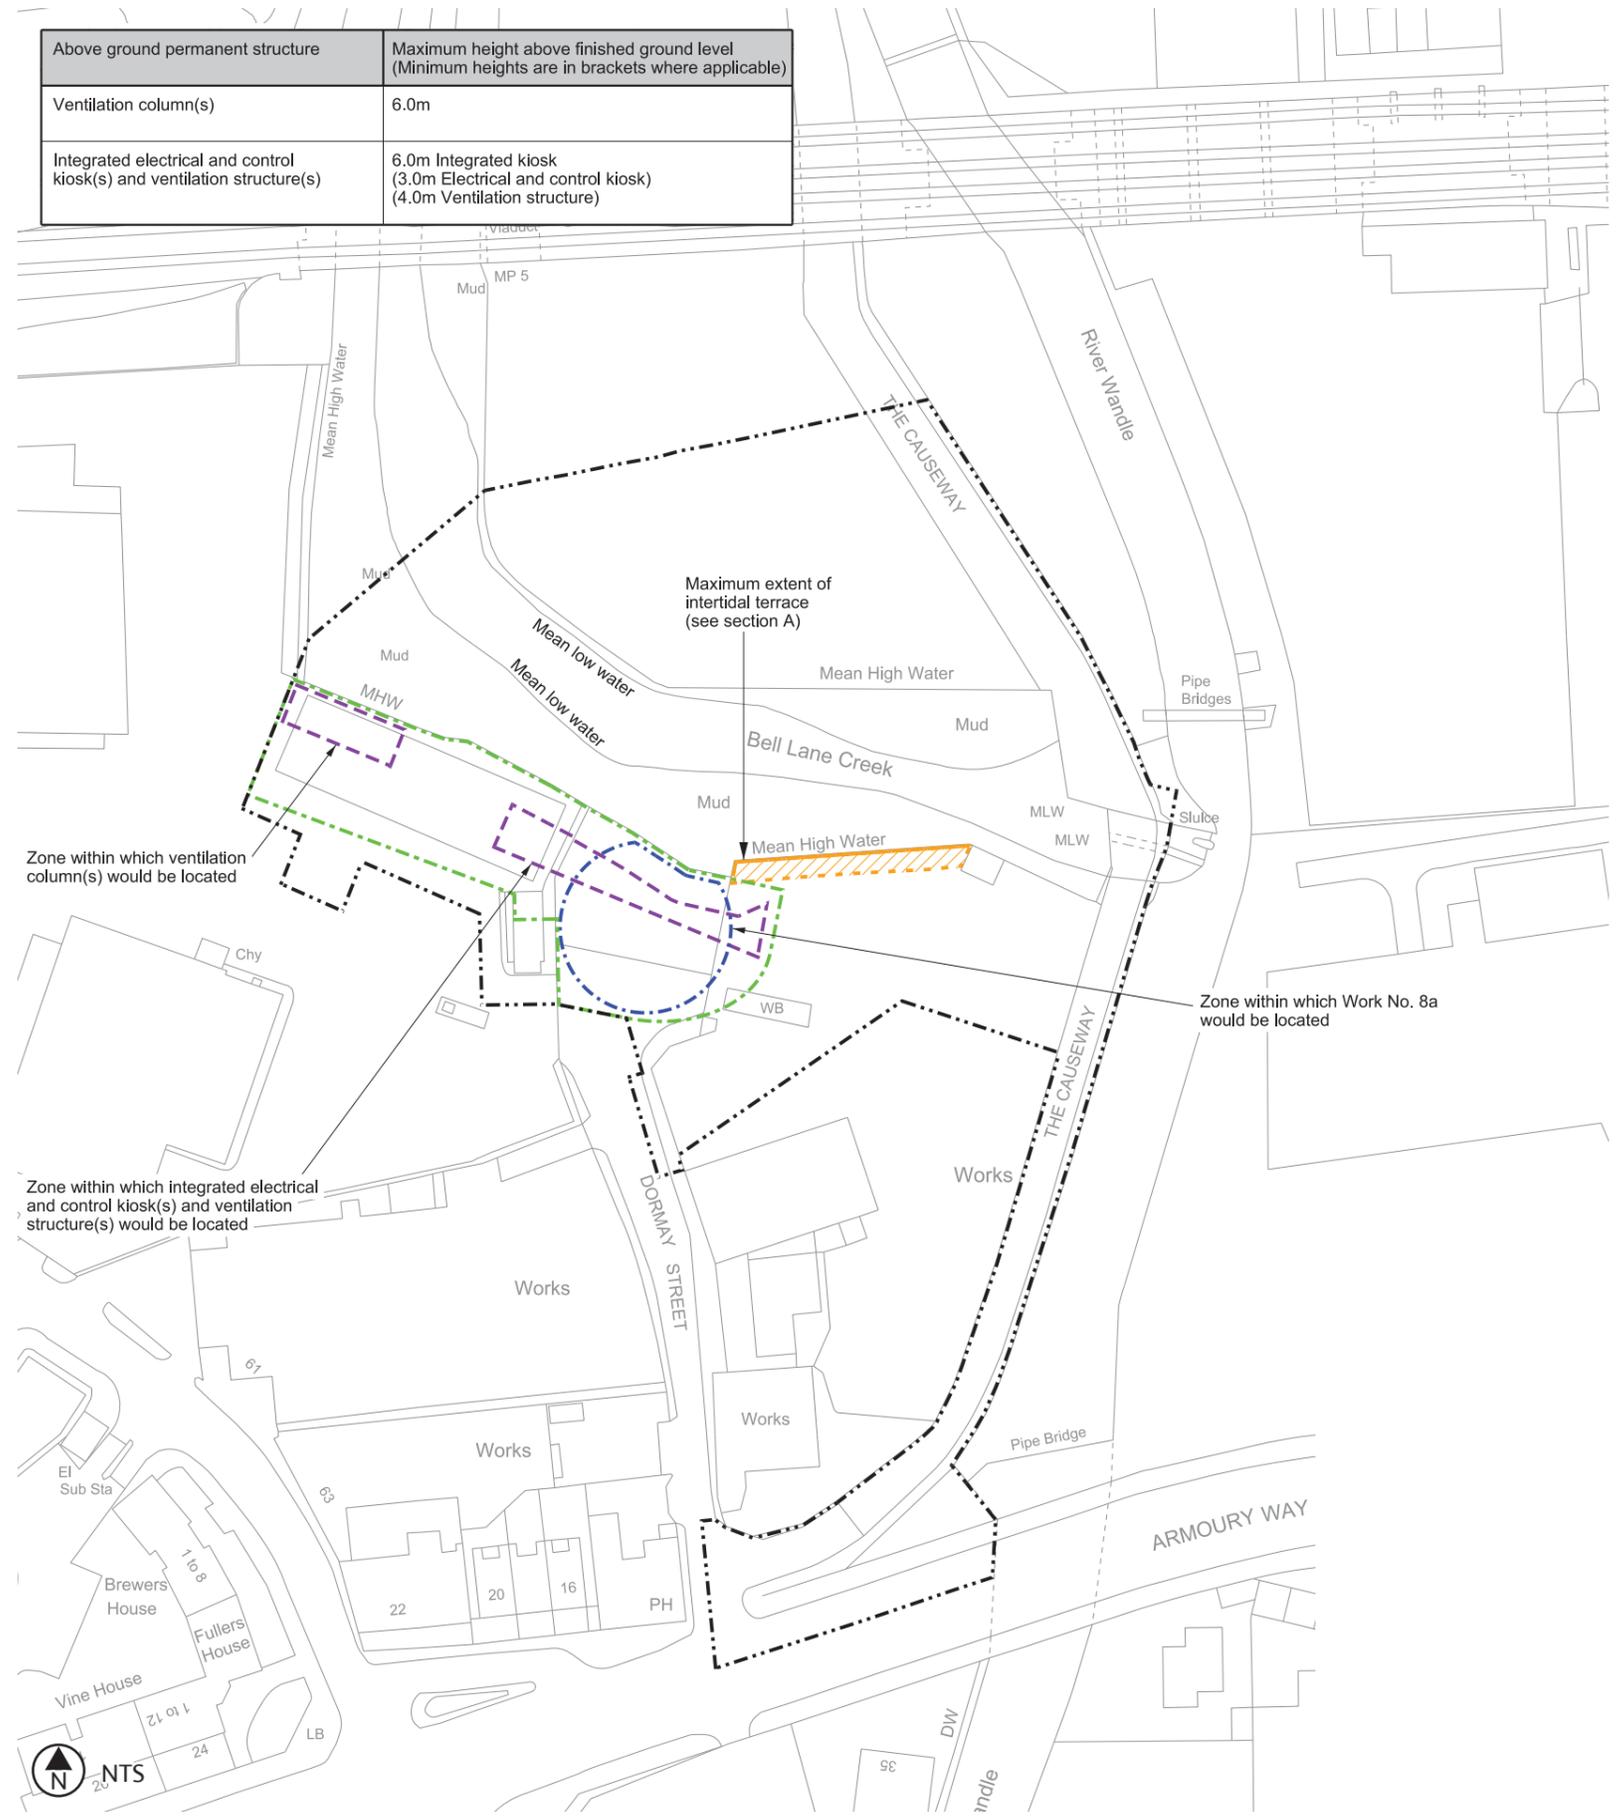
Site works parameter plan - refer to Site works parameter plan in the *Book of Plans
